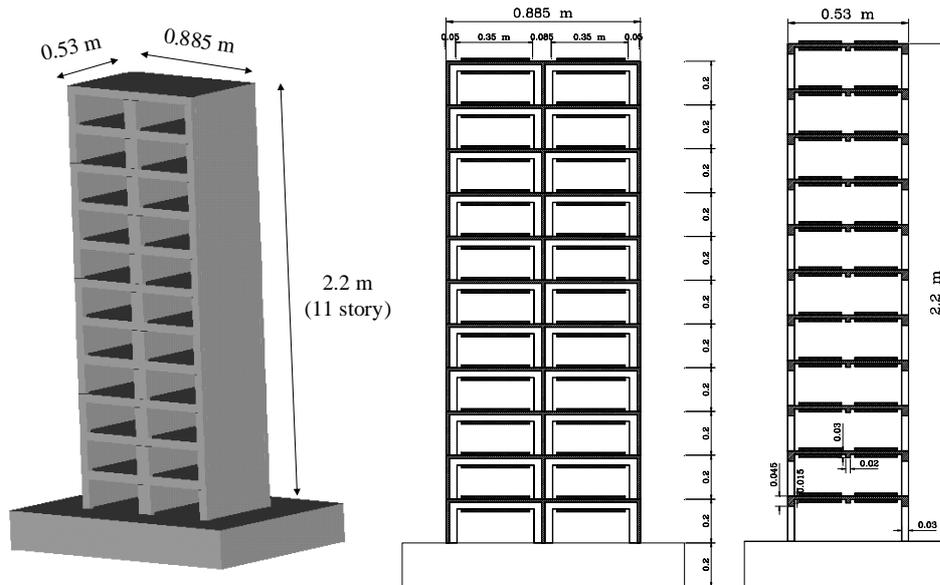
Shape, Dimensions and Loading of a Scaled RC Building Model (1/15) under Lateral Excitation
